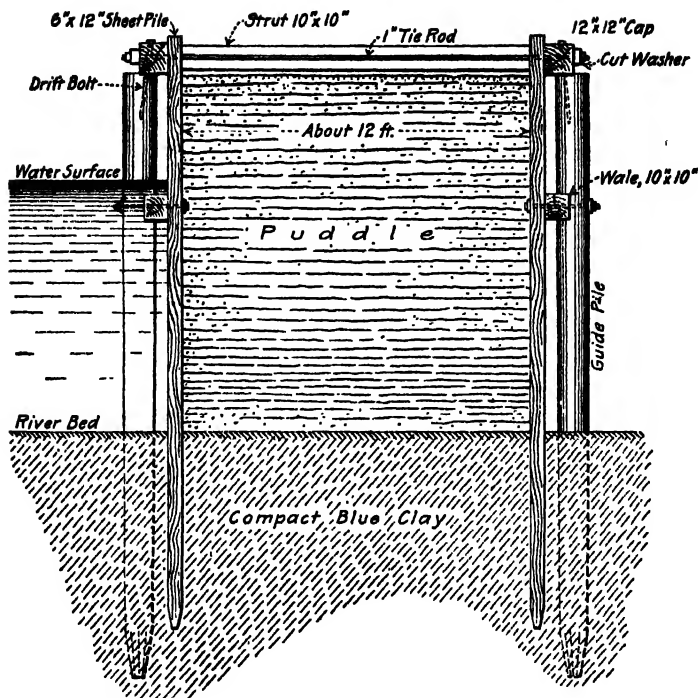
Section of the Double Wall of a Cofferdam Showing Puddle Chamber.
